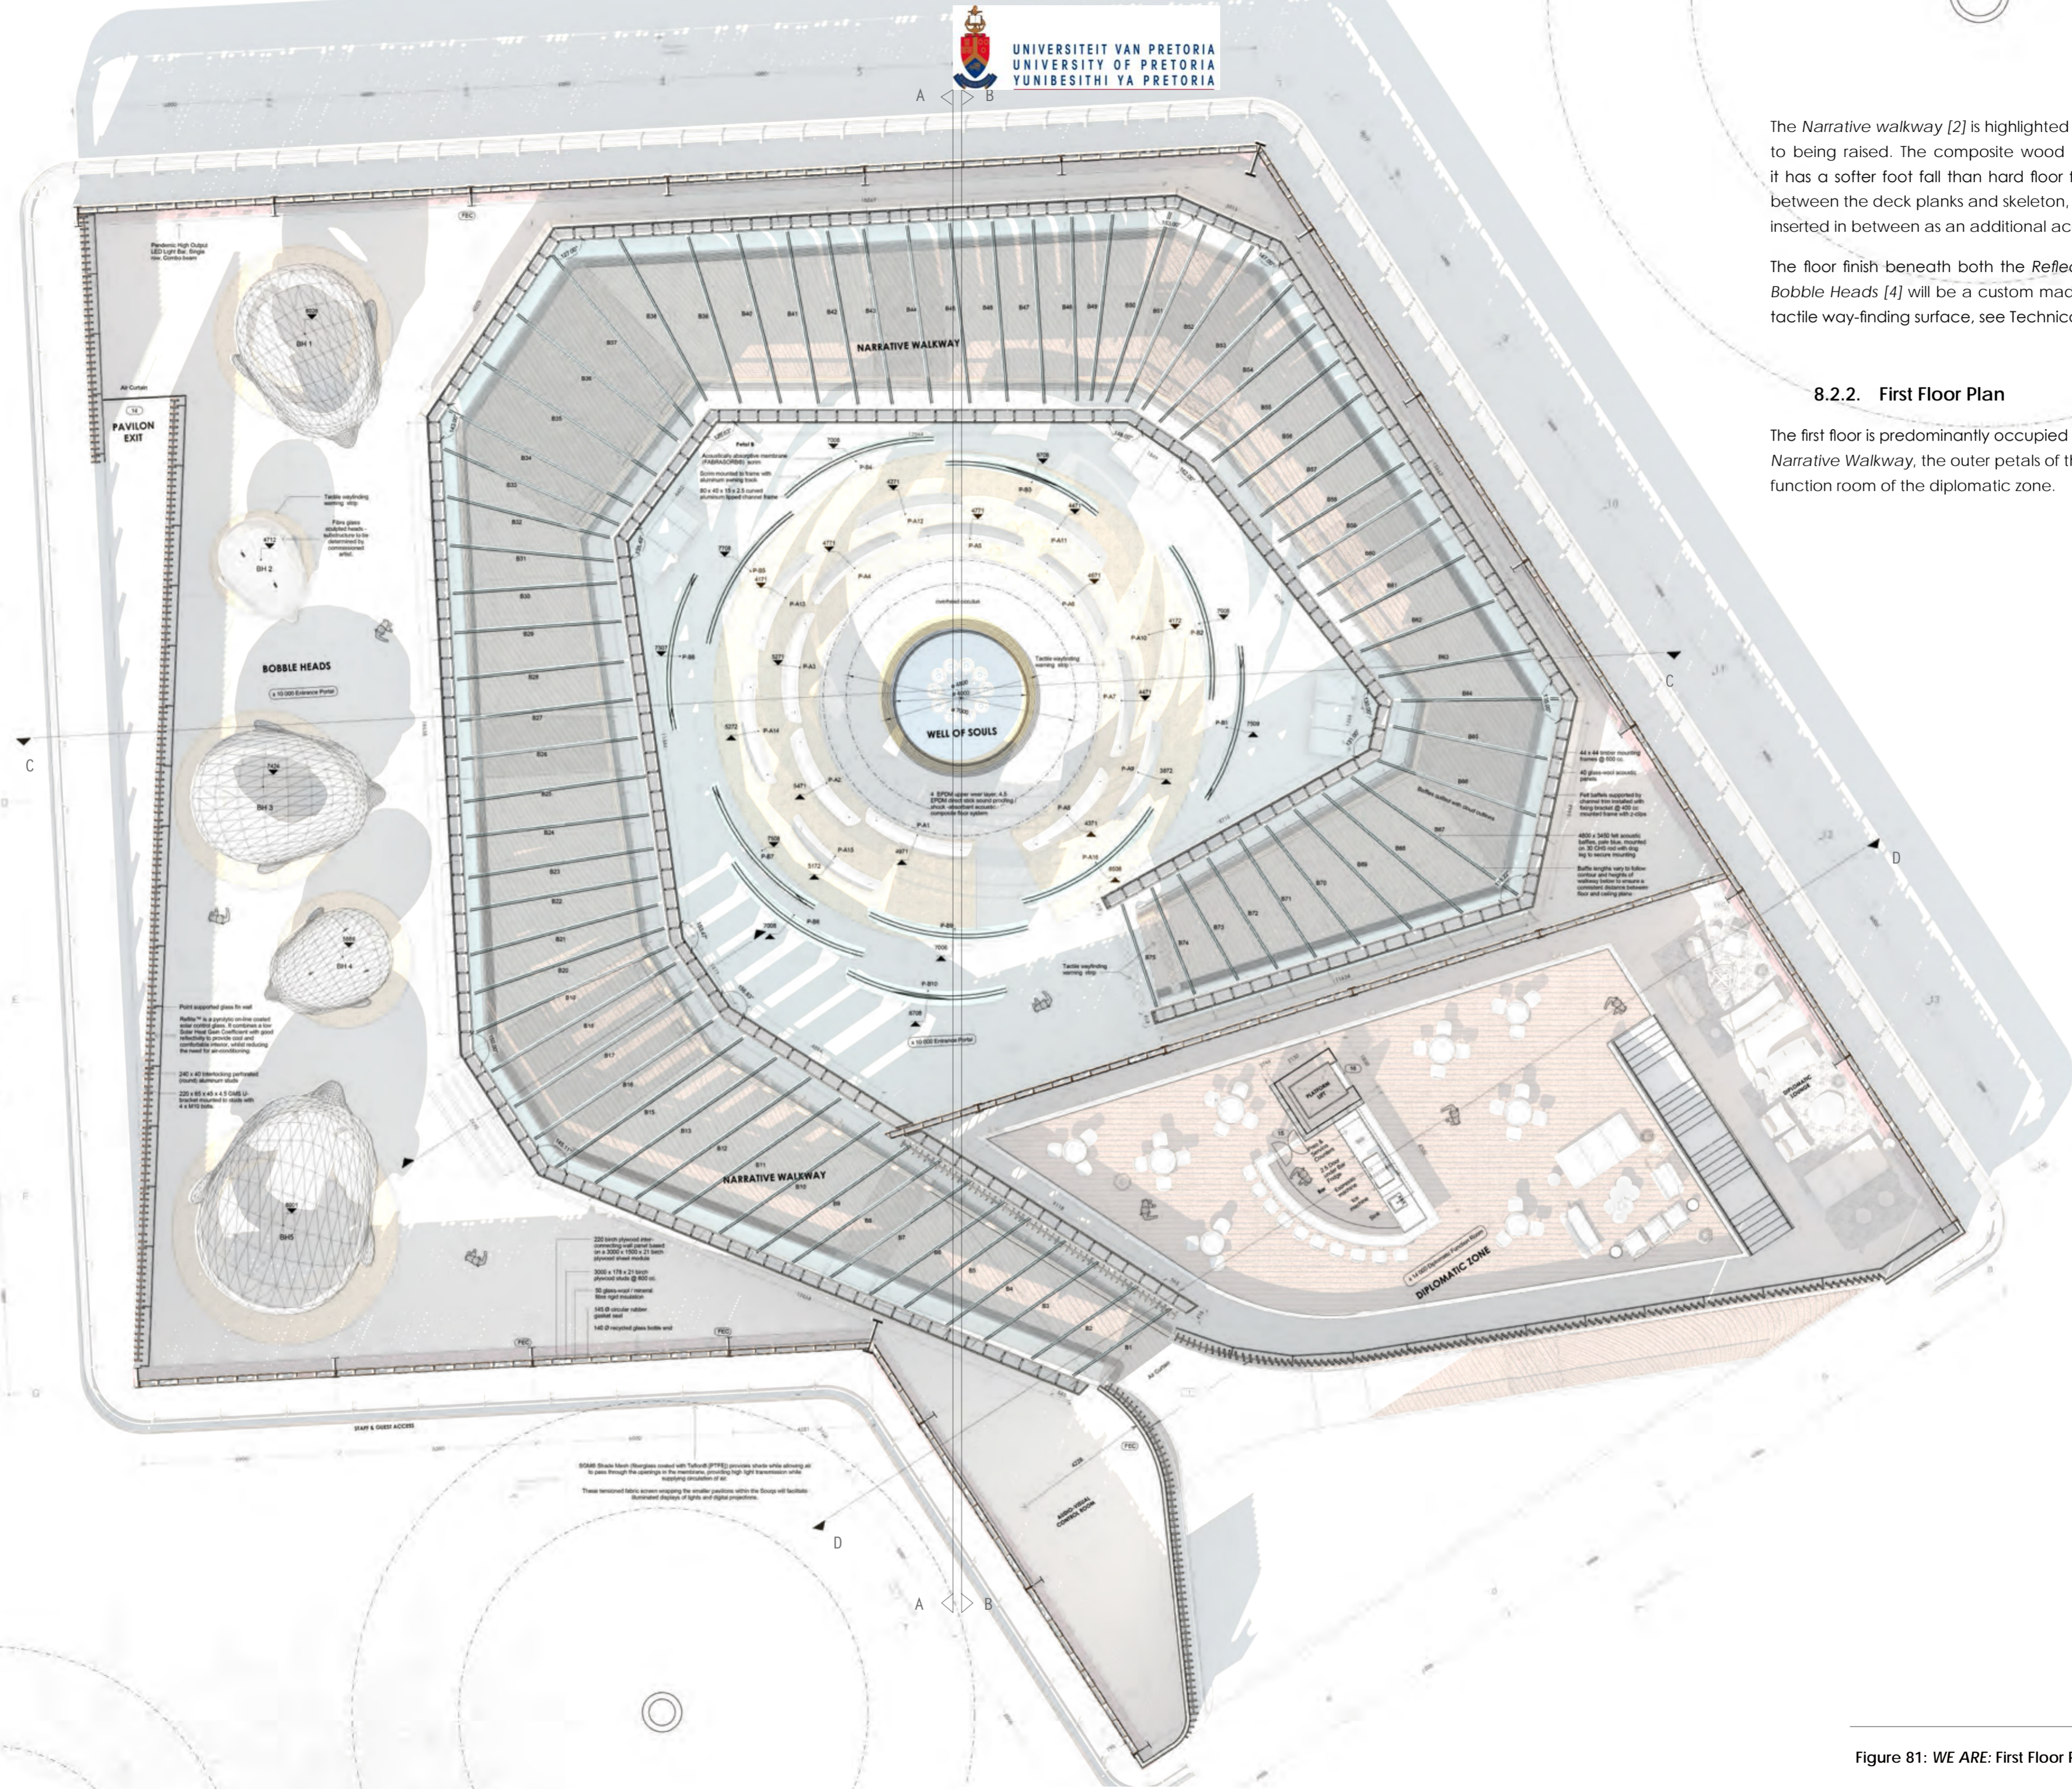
WE ARE: First Floor Plan _ Not to Scale
